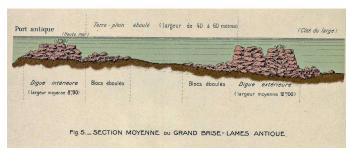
Cross-section of Pharos' breakwater (Jondet, 1916)
